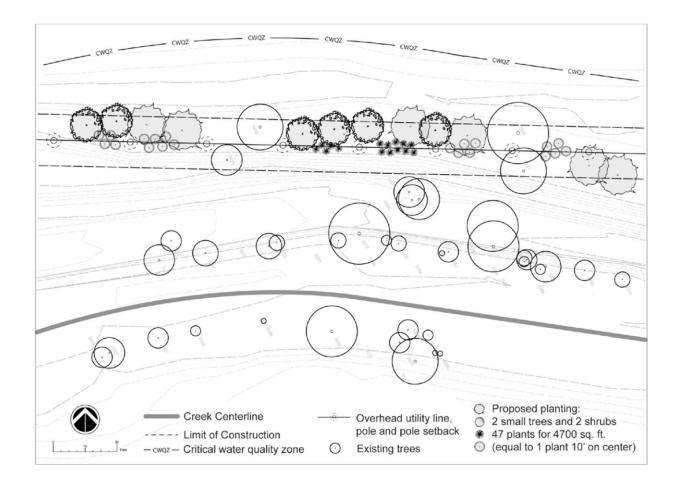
S.5-1: Example of Rooted Plant Layout and Calculation
